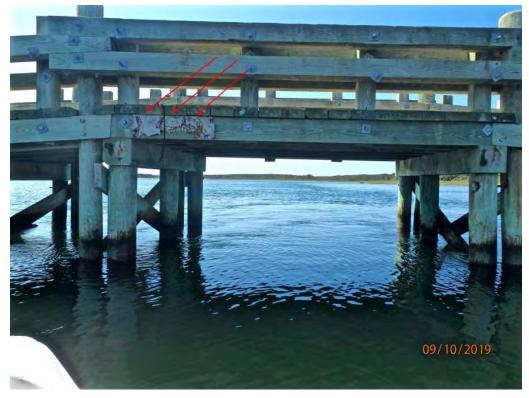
Span 5 north elevation, broken & missing navigation channel indicator sign
